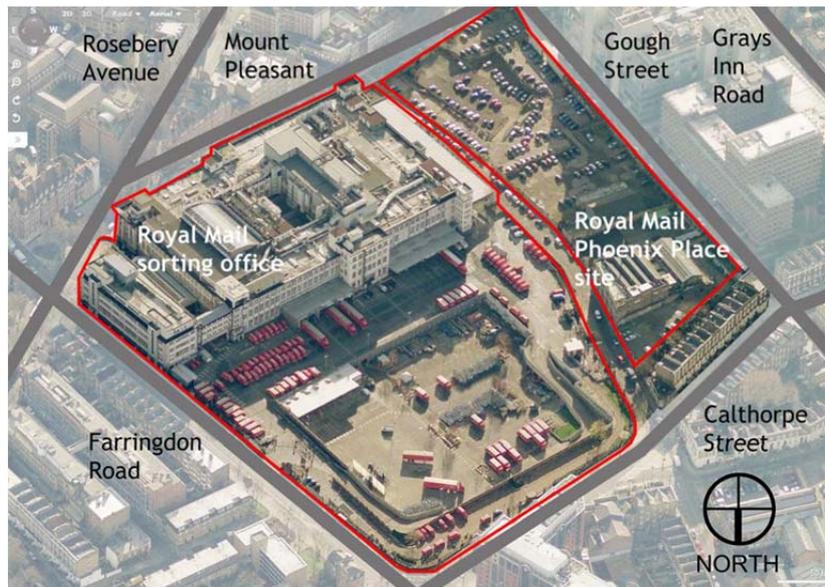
Aerial photo of site viewed from north (source: submitted Design and Access Statement)
